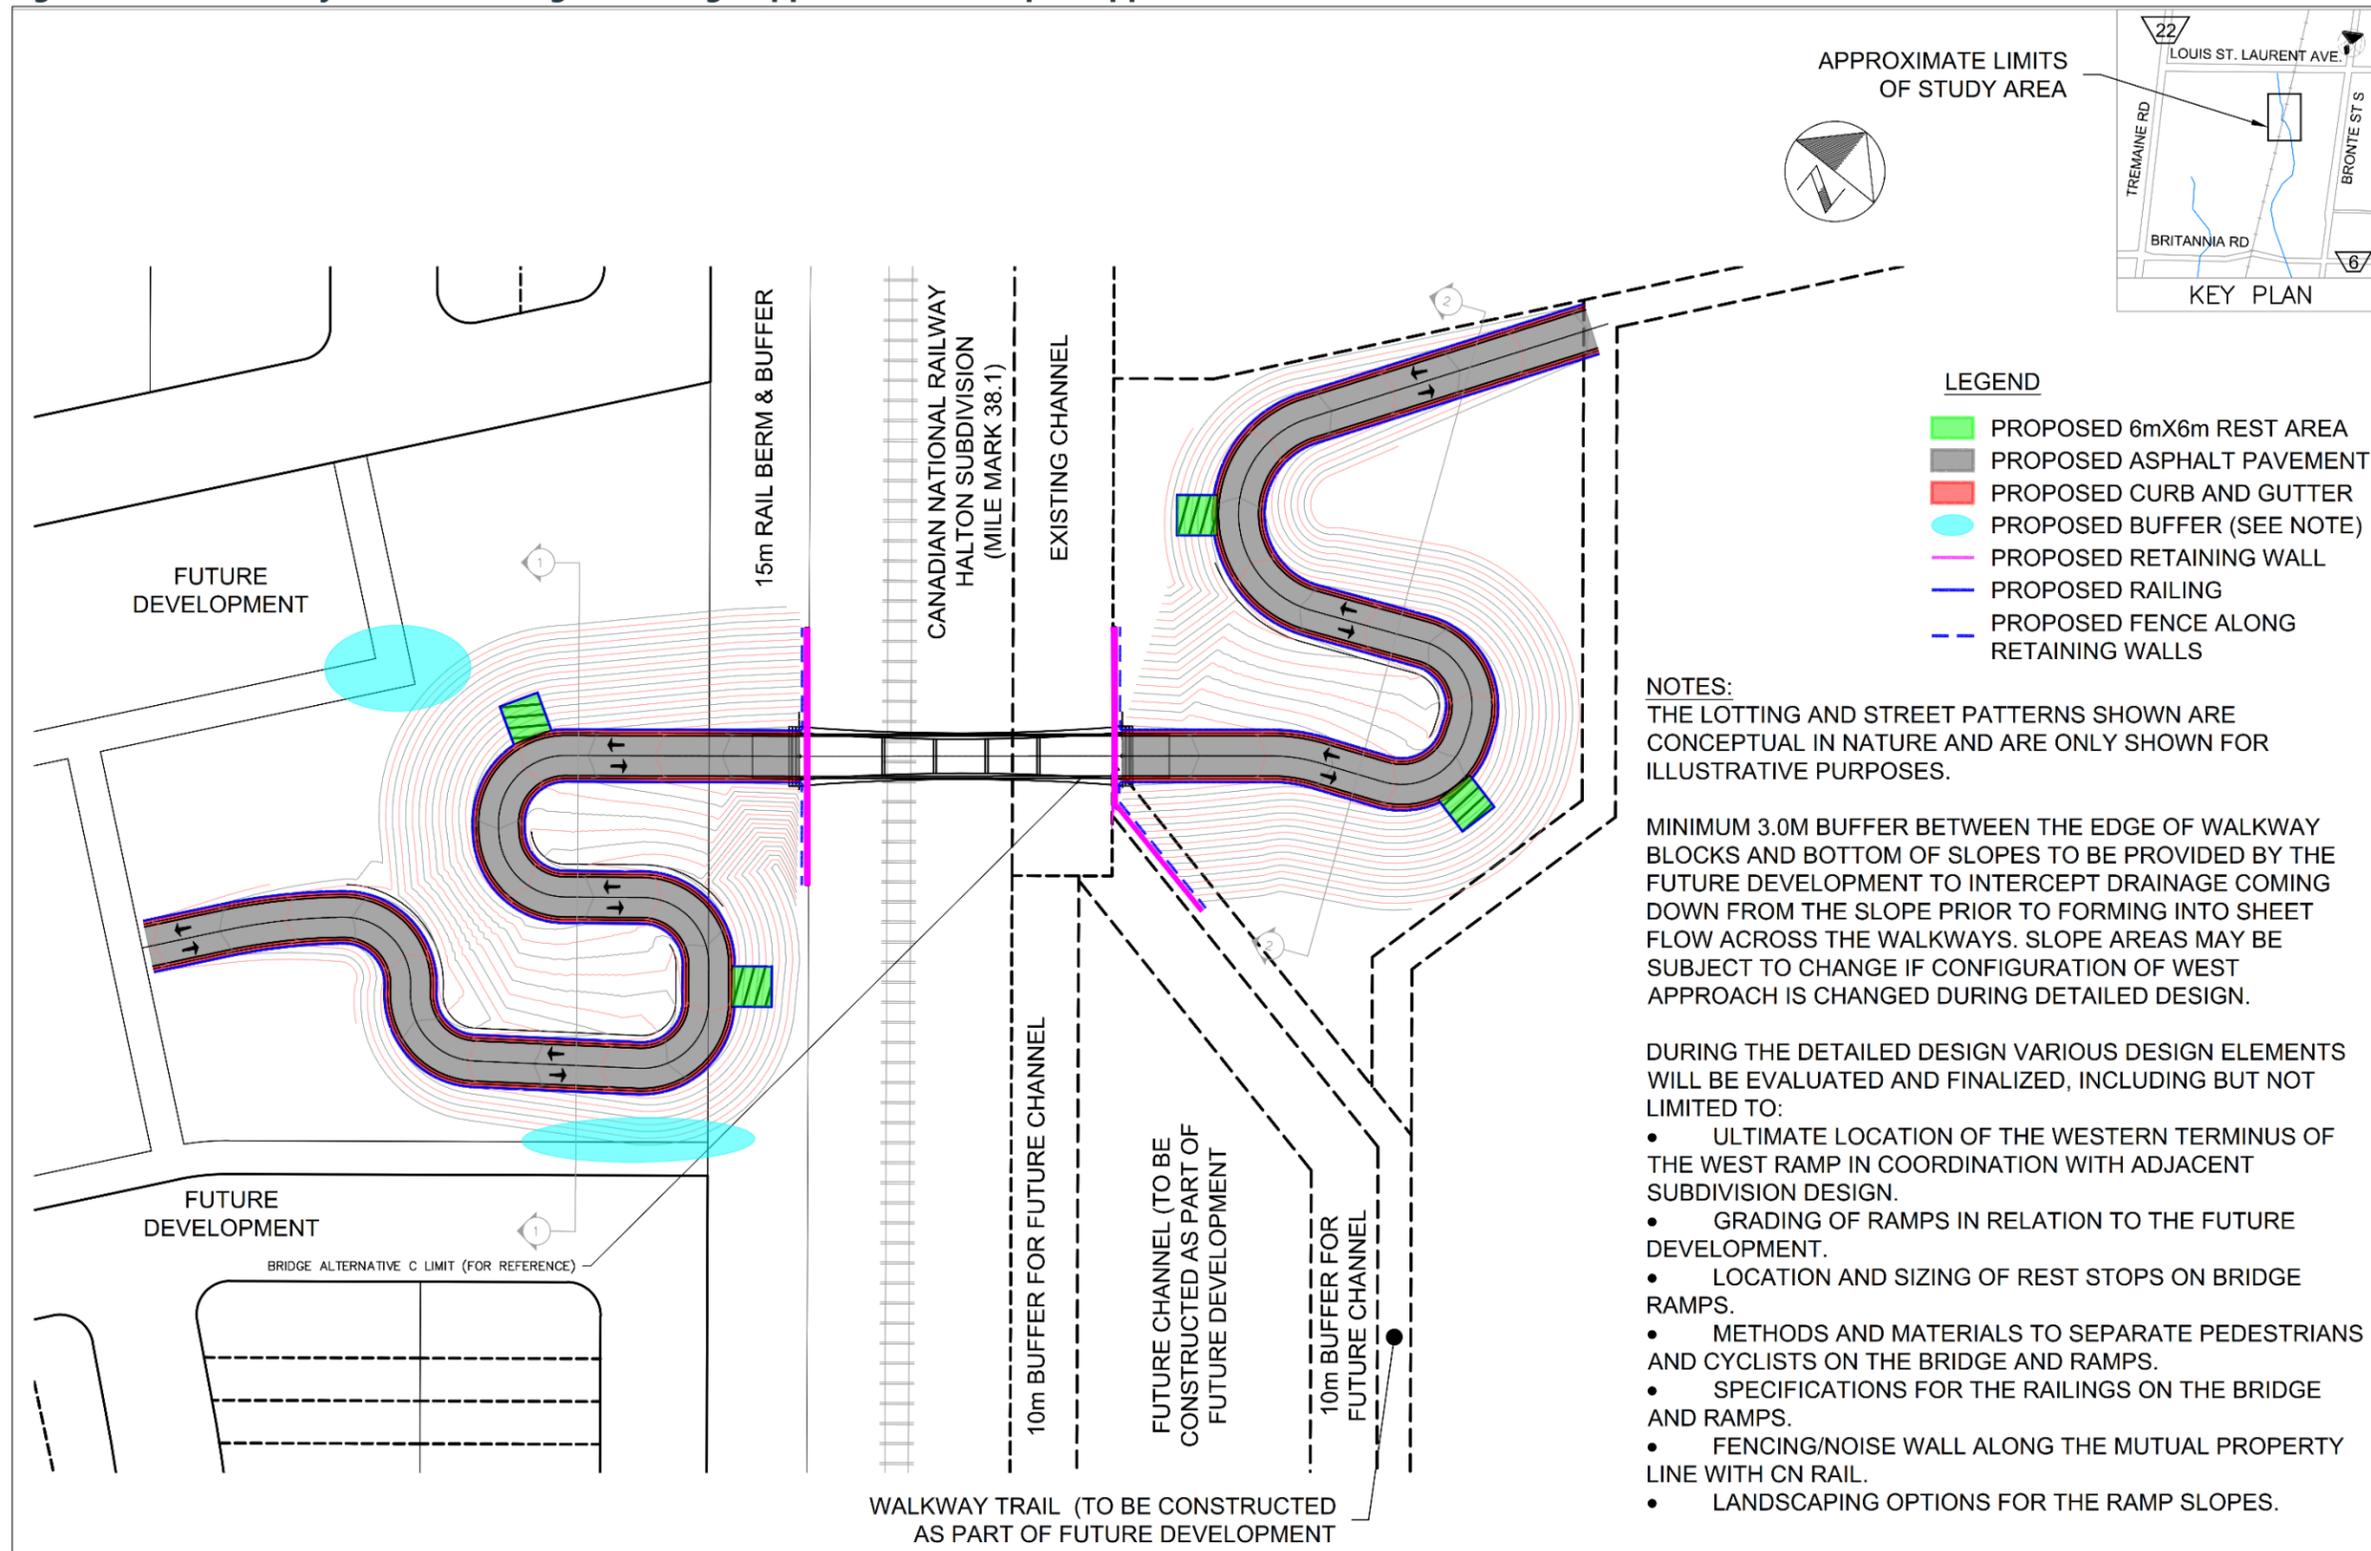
Preliminary Preferred Design for Bridge Structure - Tied Arch Bridge with Hanger Cables
